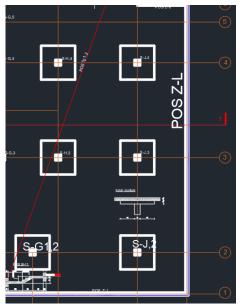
AutoCAD Plan Position of the Concreted Wall and Columns
